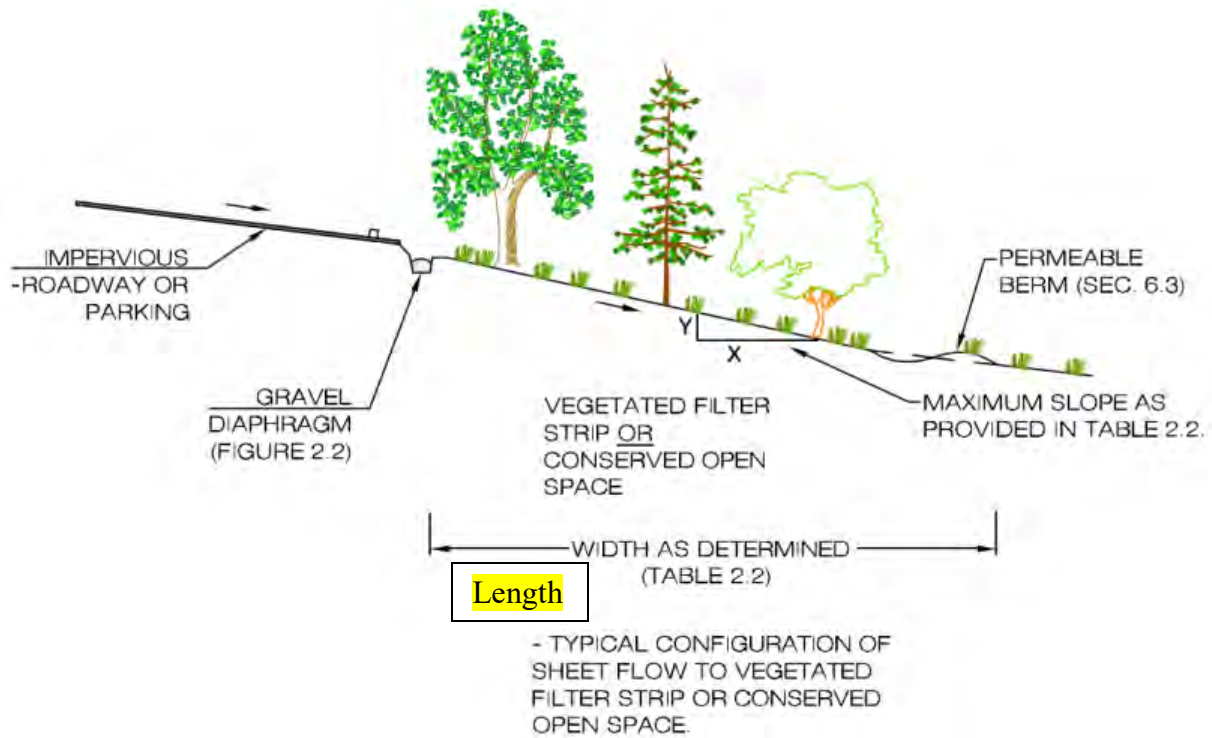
Typical Configuration of Sheet Flow to Filter Strip or Conserved Open Space
